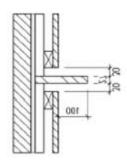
Exemplary wooden façade cladding assemblies with fire stops that were examined in [22]
